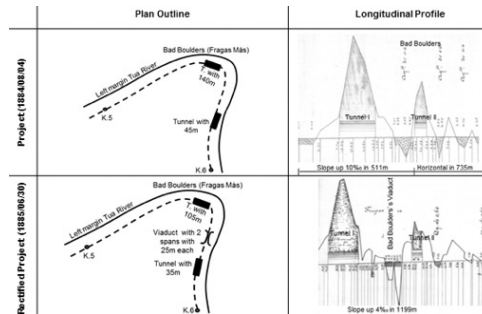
Plan outline and the longitudinal profile for railway between Foz Tua and Mirandela in Presas site for the project and rectified project (adapted REFER archives)
